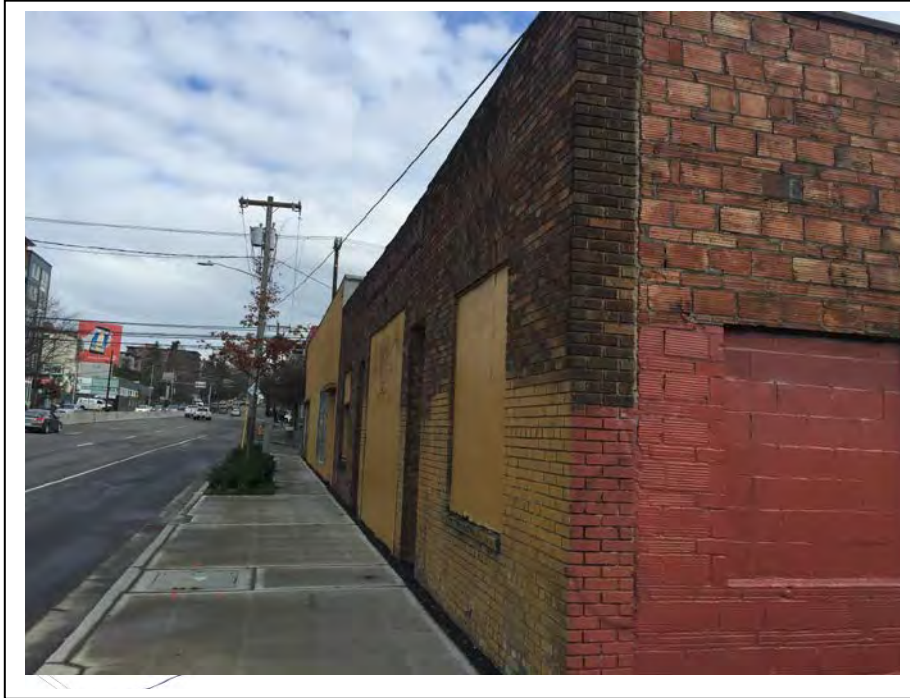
615 Dexter Avenue North, Seattle, Washington – The west side of the building looking north.
